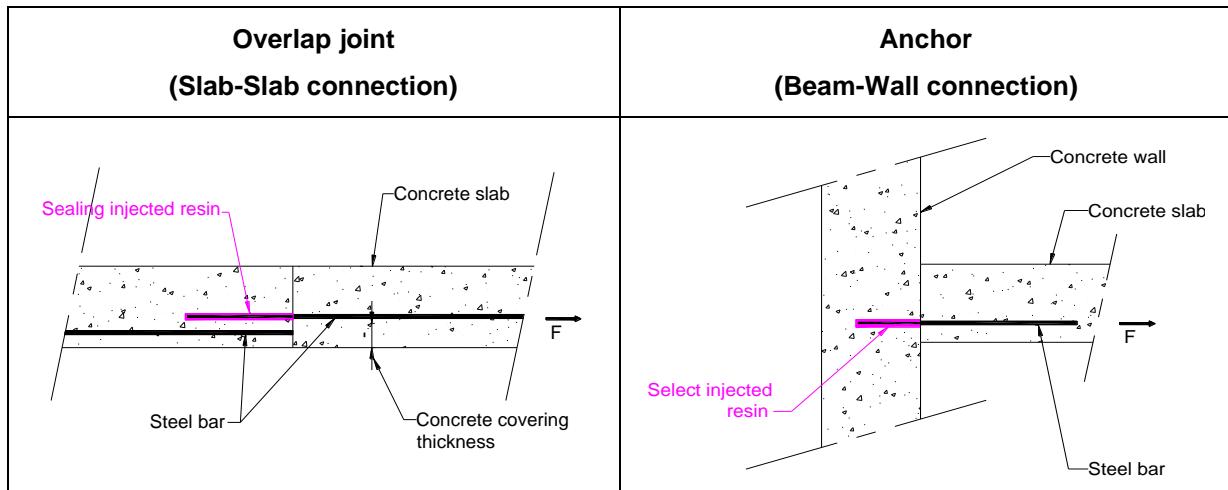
Sketches of a Slab-Slab connection (left) and of a Beam-Wall connection (right)
